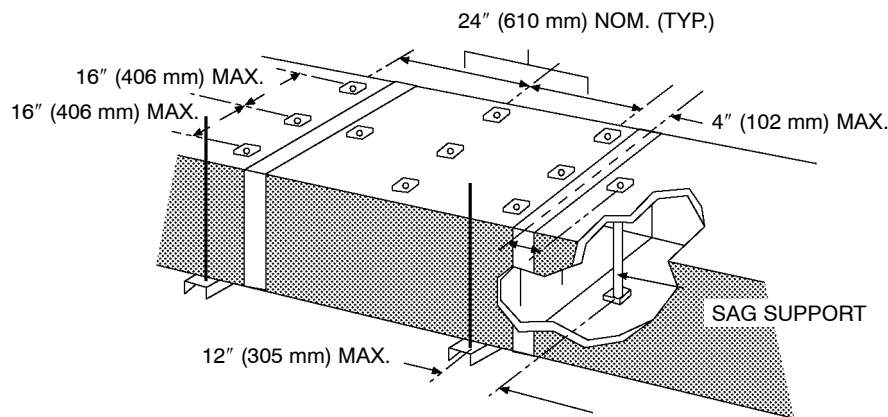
TIE-ROD REINFORCEMENT ROWS ON 24-INCH (610 mm) CENTERS, 48-INCH (1219 mm) DUCT SECTION
